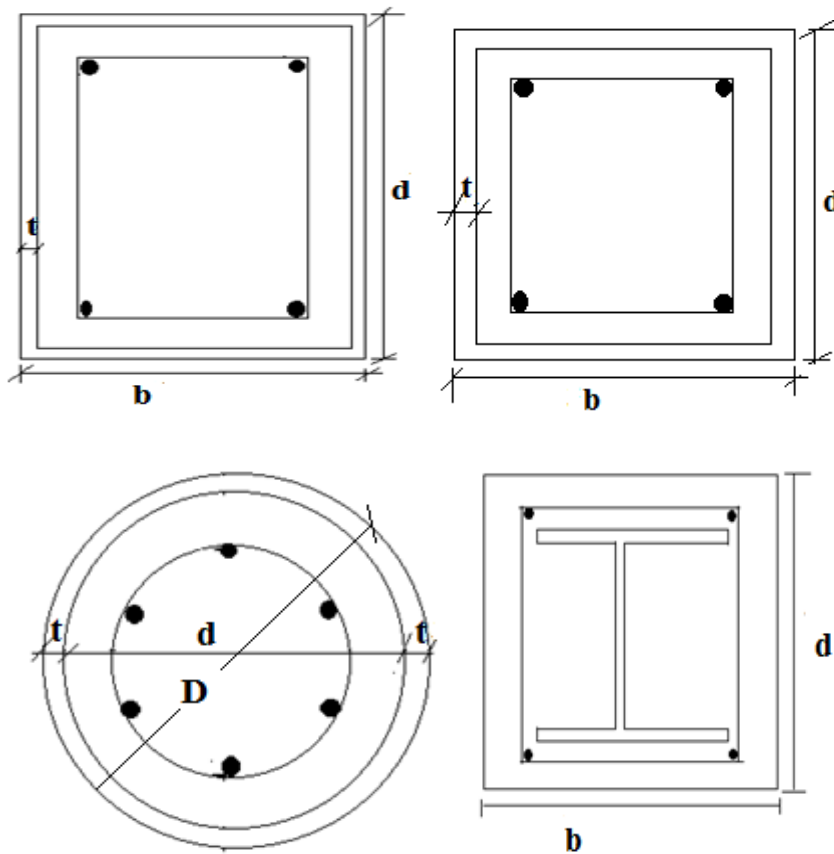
Cross-section taken for the analysis with longitudinal reinforcement
